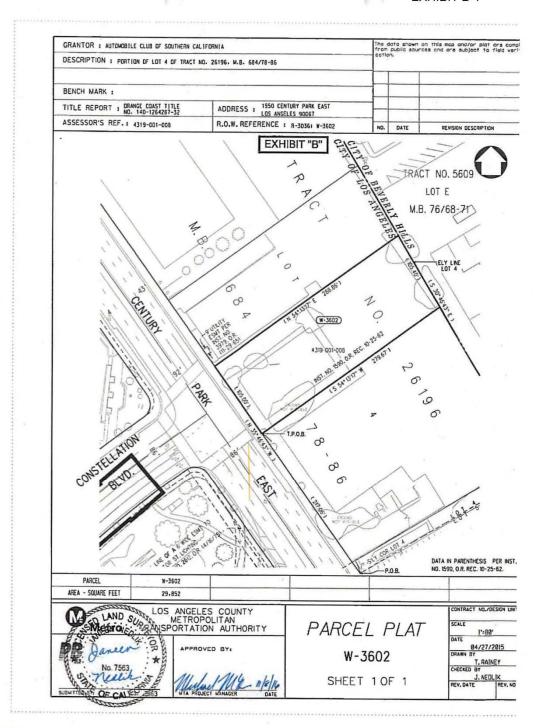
Subsurface Tunnel Easement Plat Map
